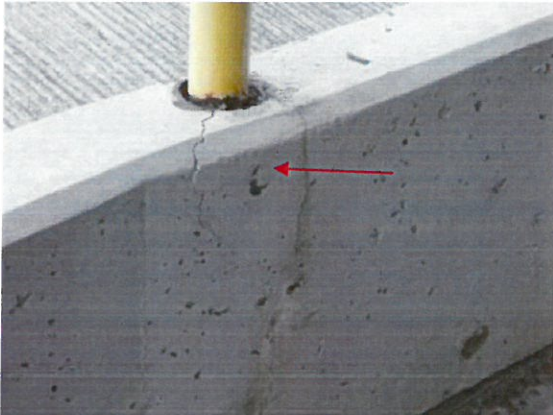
Corrosion of steel posts for guardrails and concrete delamination around the post
